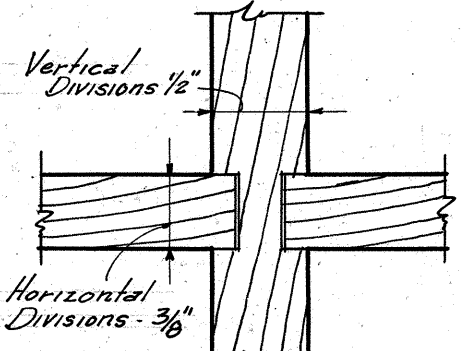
DETAIL OF MAIL BOX IN WAITING ROOM #120.
